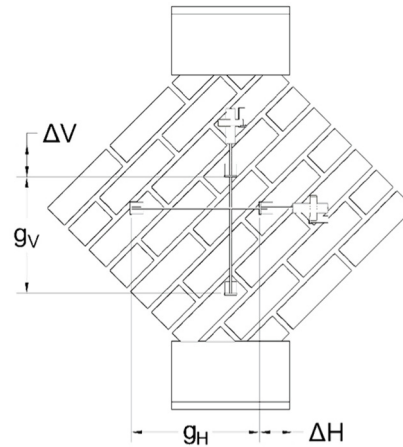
Schematic of wall panel showing loading and displacement measurement.
